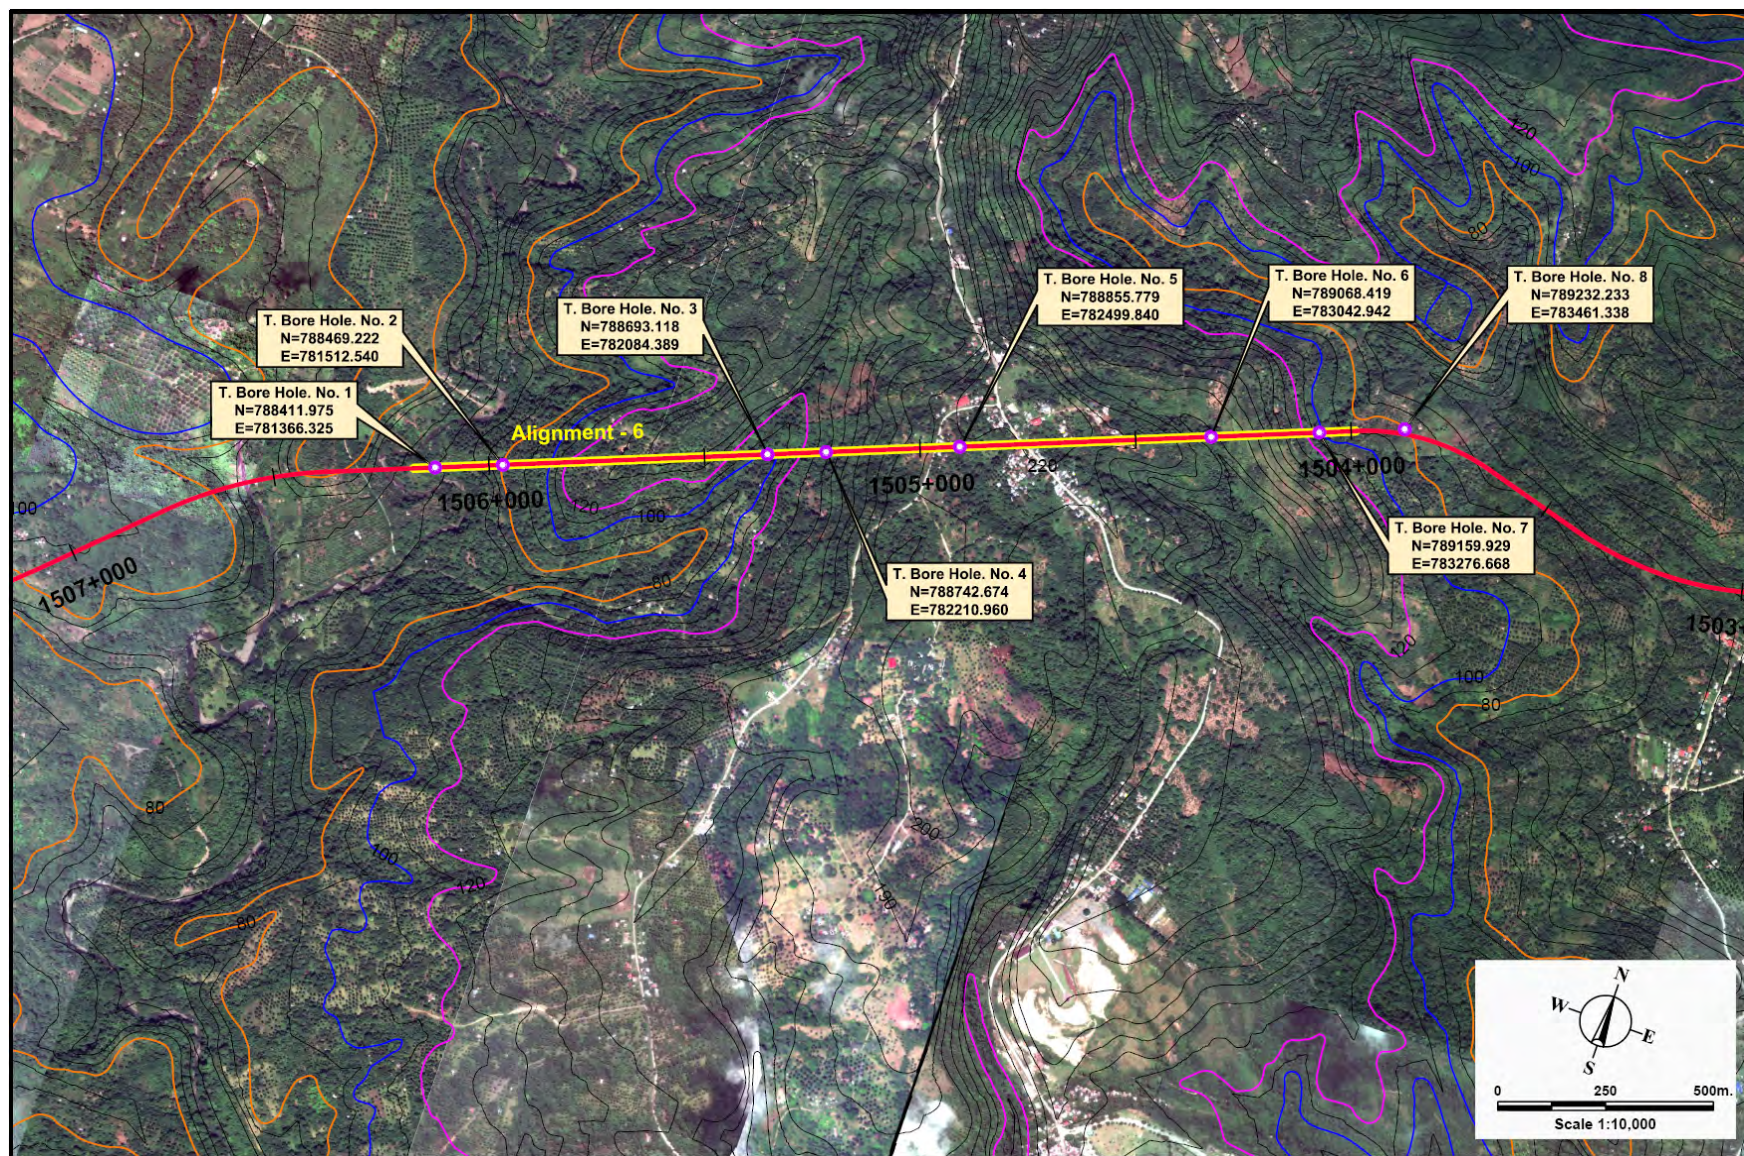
TUNNEL SECTION BORING LOCATION MAP
